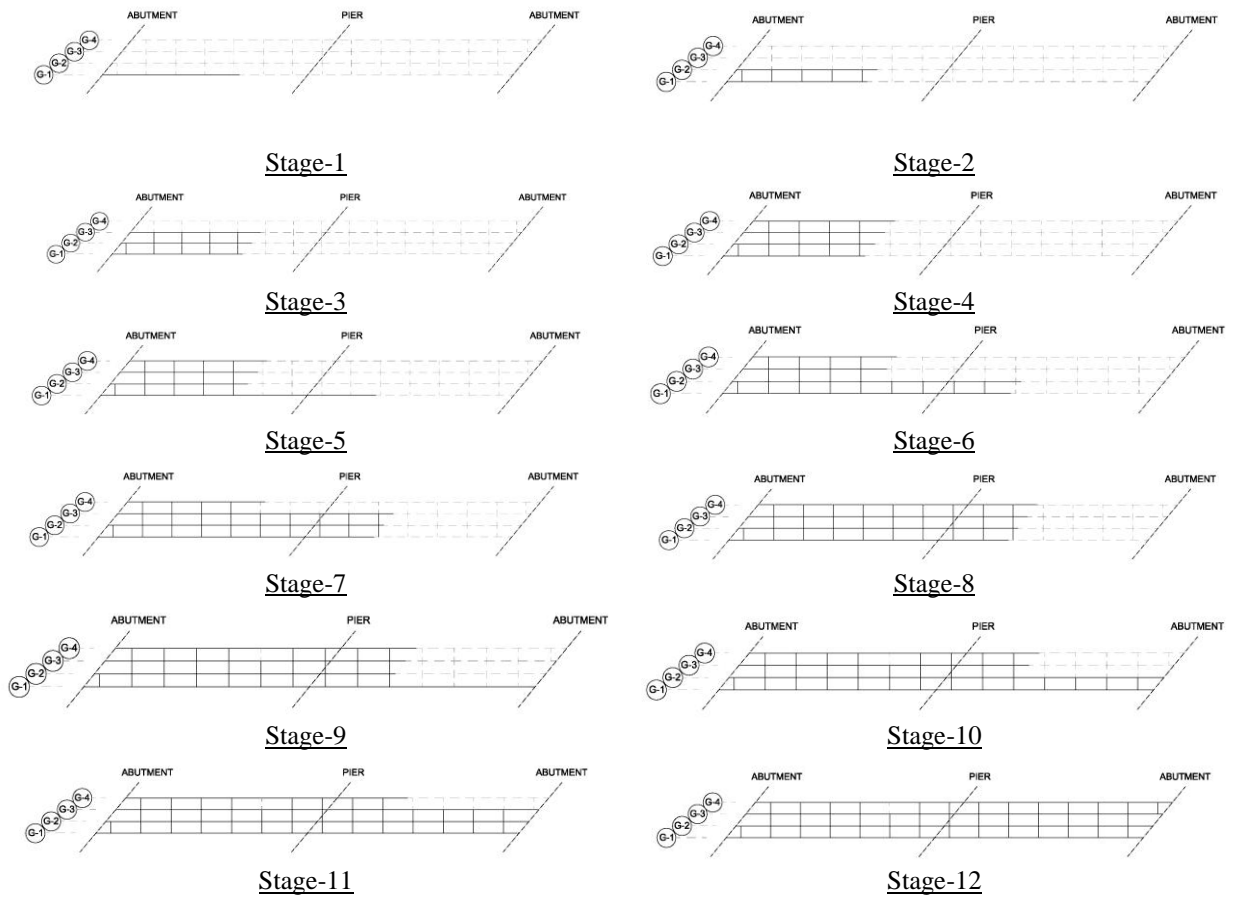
Stage 1 to Stage 12 of Construction for Single-Girder Erection of Two-Equal-Spans, 4-Girder Bridges.
